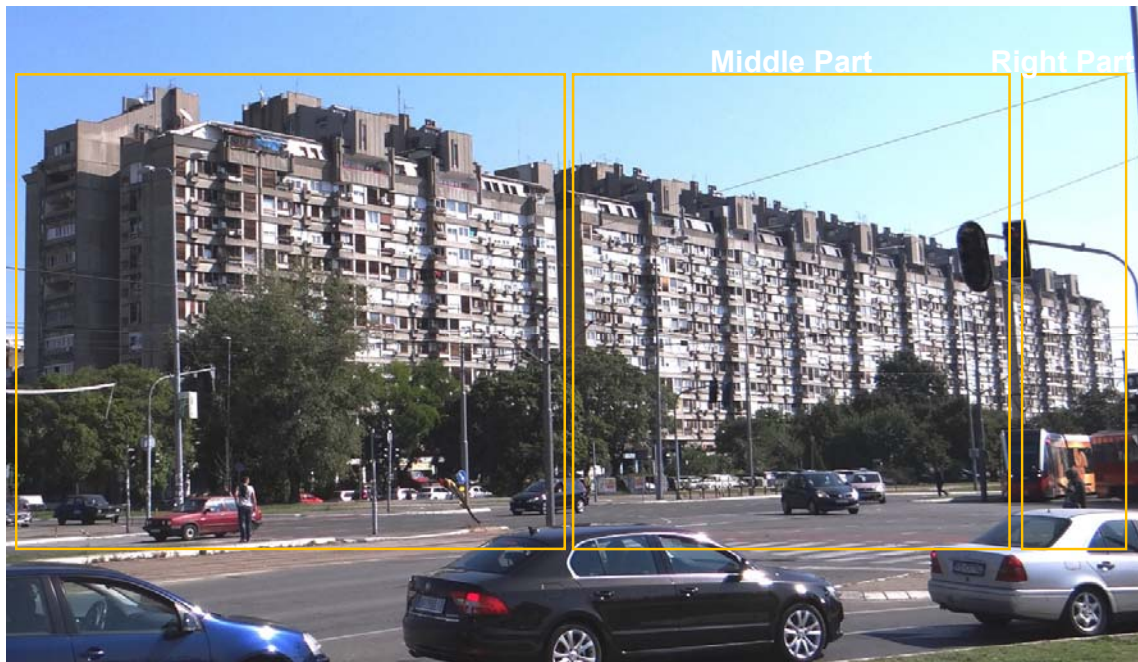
Building 6 Block 23 New Belgrade; exterior view from east, adopted from (Jadranka Ahlgren 2016).
